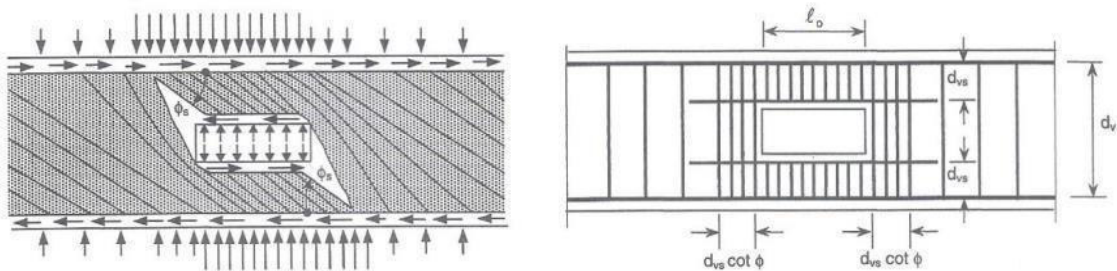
Left: Truss action, Right: Arrangement of reinforcement [AIJ 1994]
